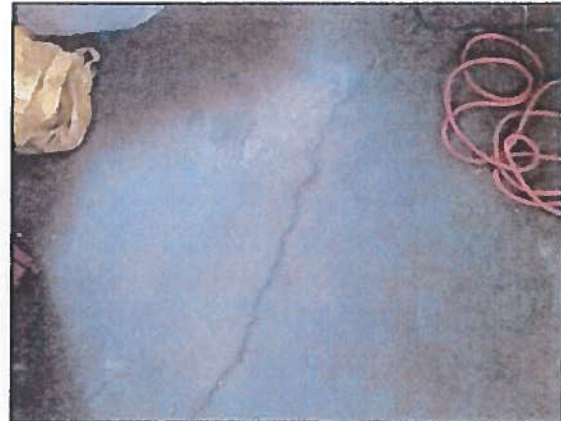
Storage Building – Minor cracking in building floor slab
